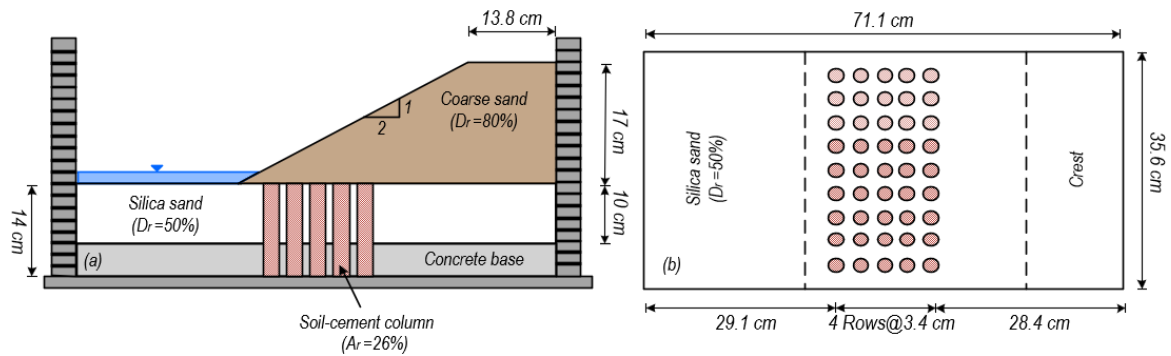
2D model configuration with dimensions in model scale (cm) (a) side view of the embankment model, (b) plan view of the soil foundation
